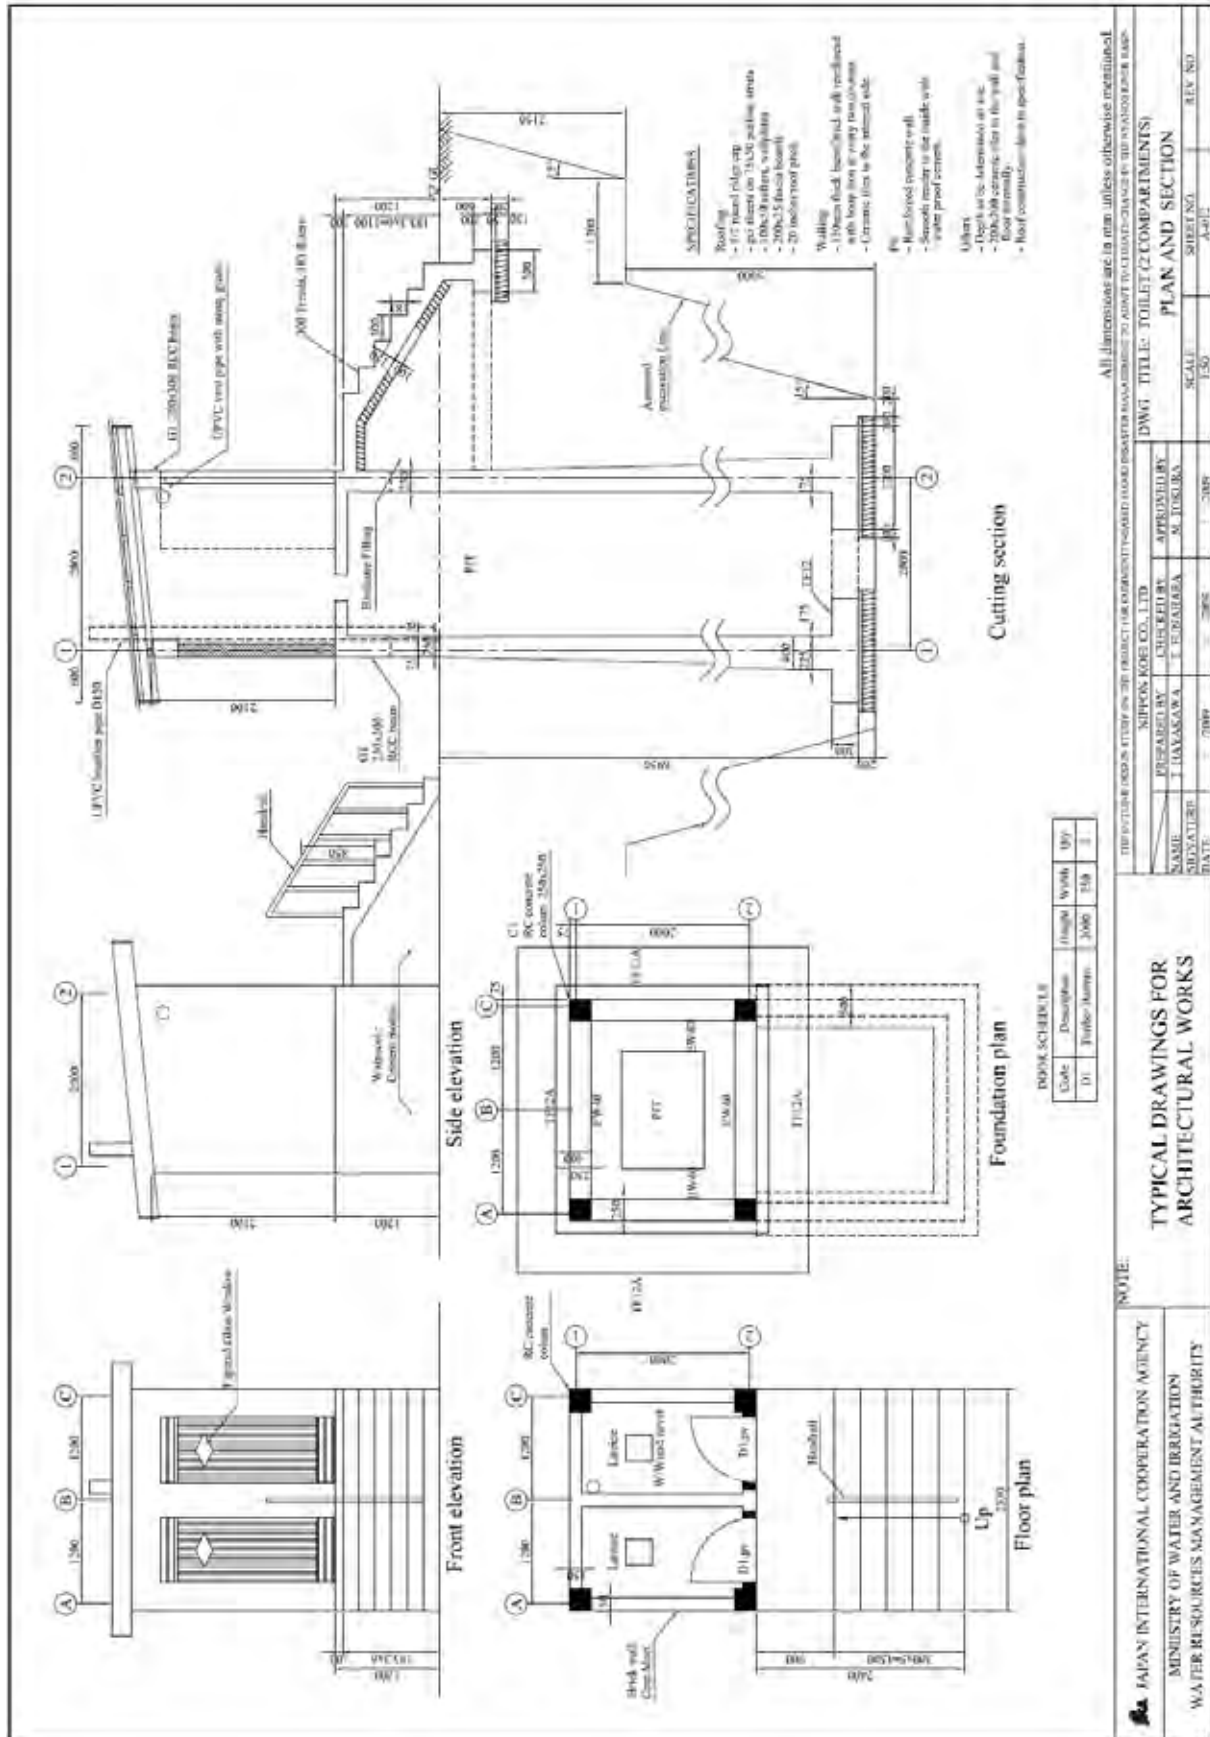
Toilet (2 compartments): Plan and Elevation
